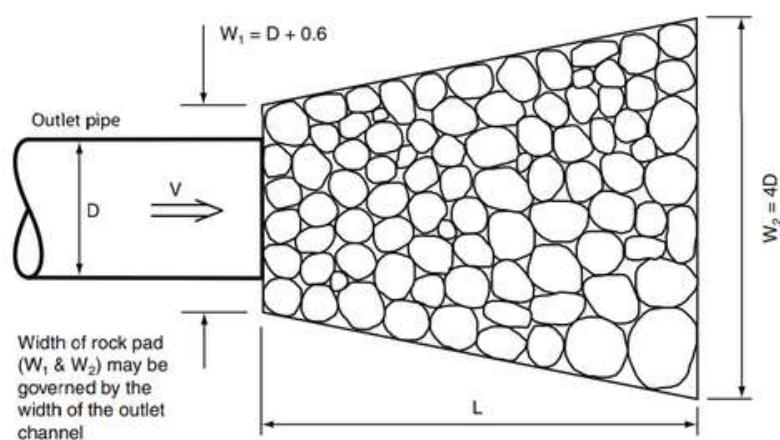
Plan view diagram indicating the dimensions and construction details of a recessed rock pad, which would act as protection against scour at a pipe outfall. *Figure from Catchments and Creeks Pty Ltd.
